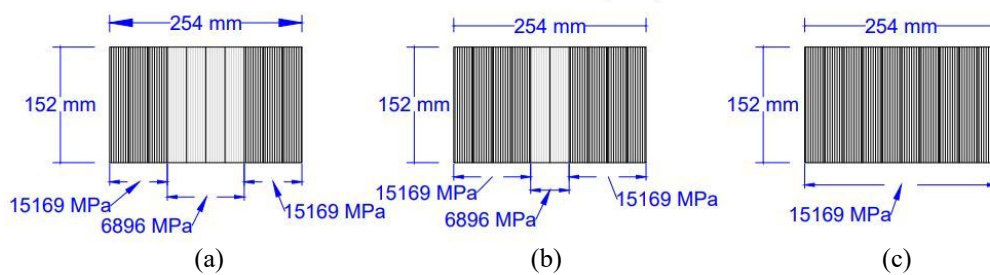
MPP layout detail for three specimen casing types: (a) soft; (b) medium; (c) hard
